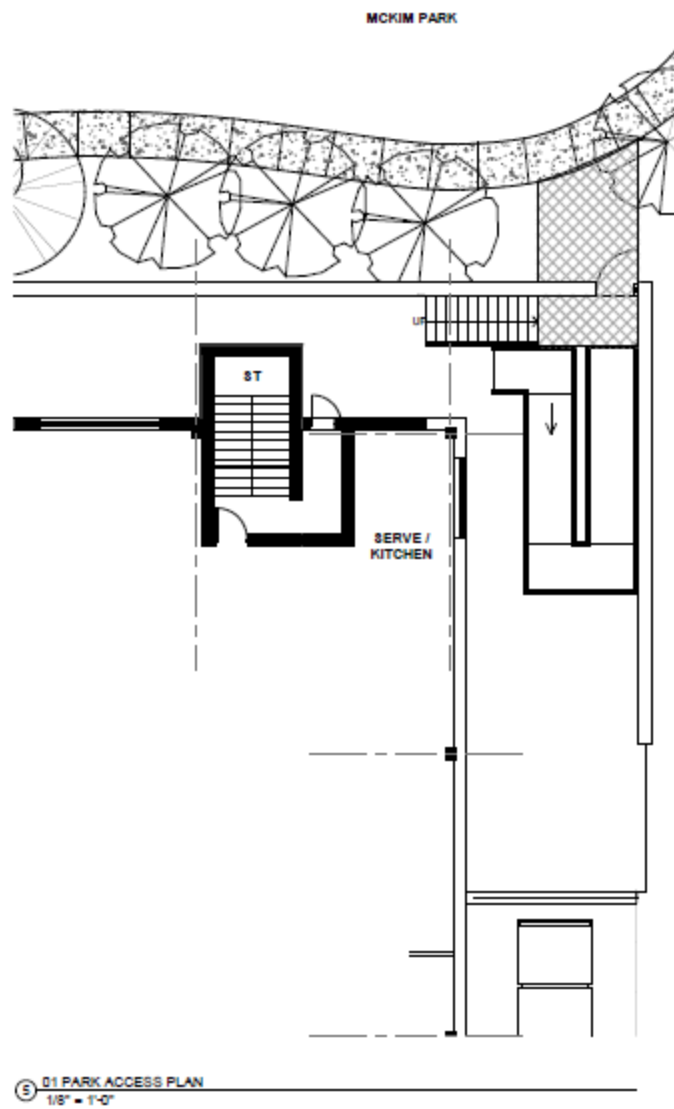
McKim Park Access – Detail, Colimore Architects, July 20, 2018
